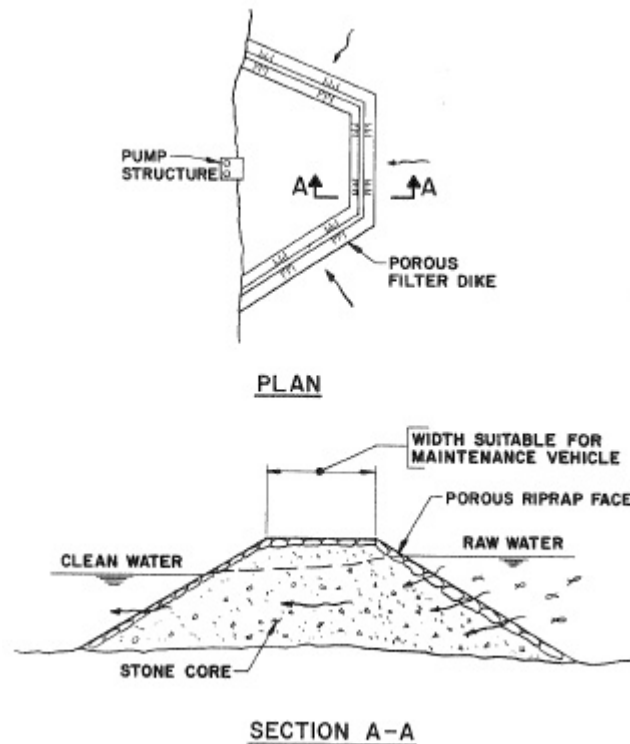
Plan and Section View of a Porous Dike [Ref. 6.2]
